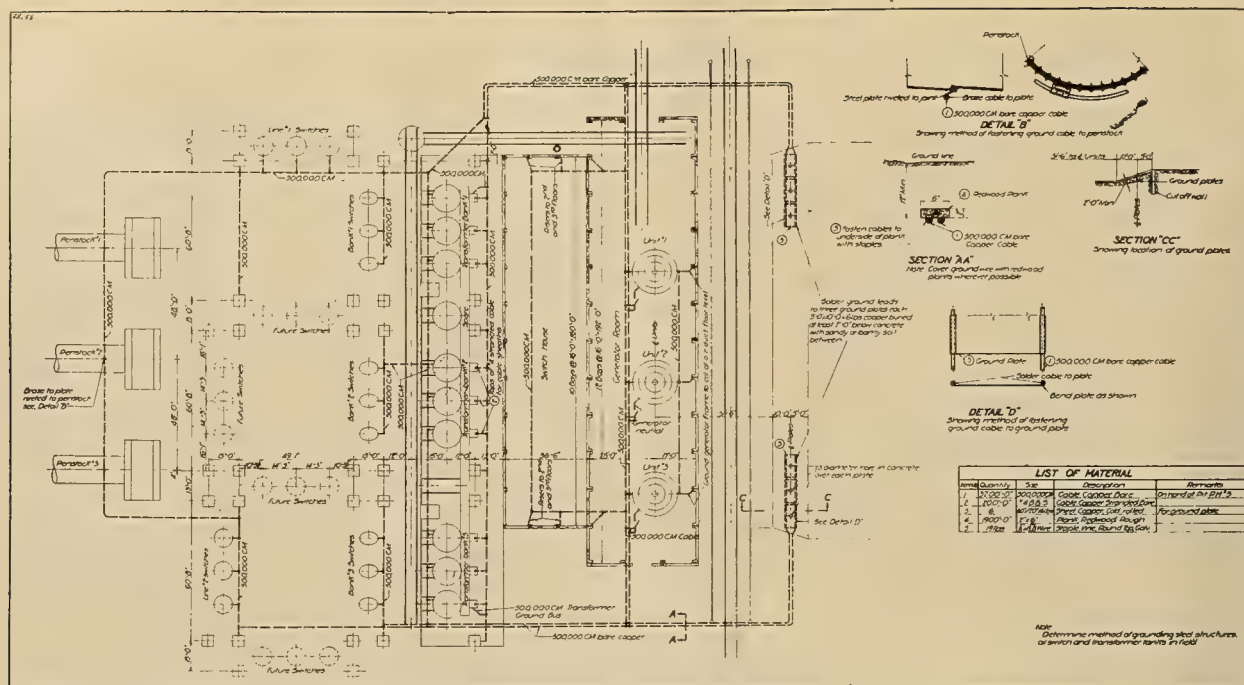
Arrangement of ground plates and cables at Pit 3 power house.
